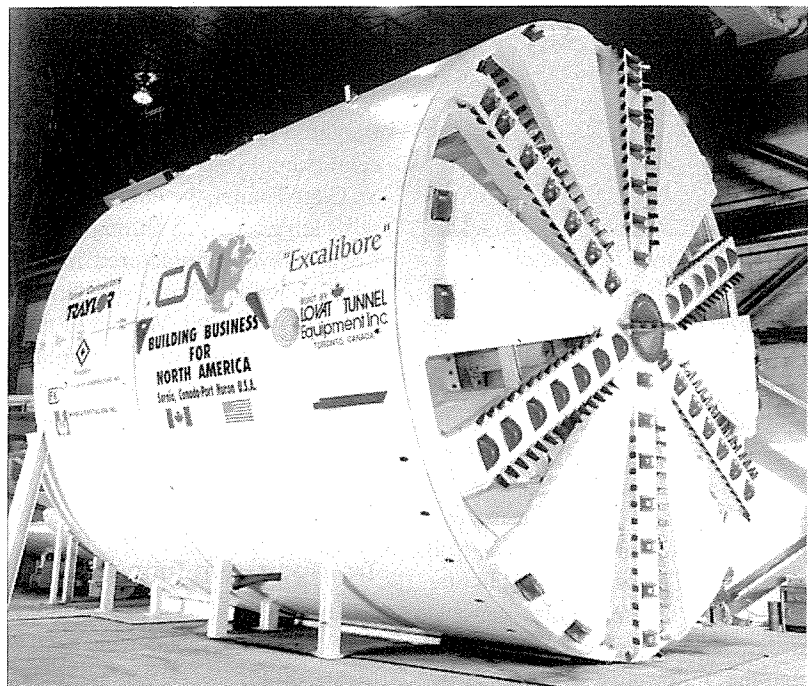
Lovat TBM used to drive new St. Clair Tunnel.
